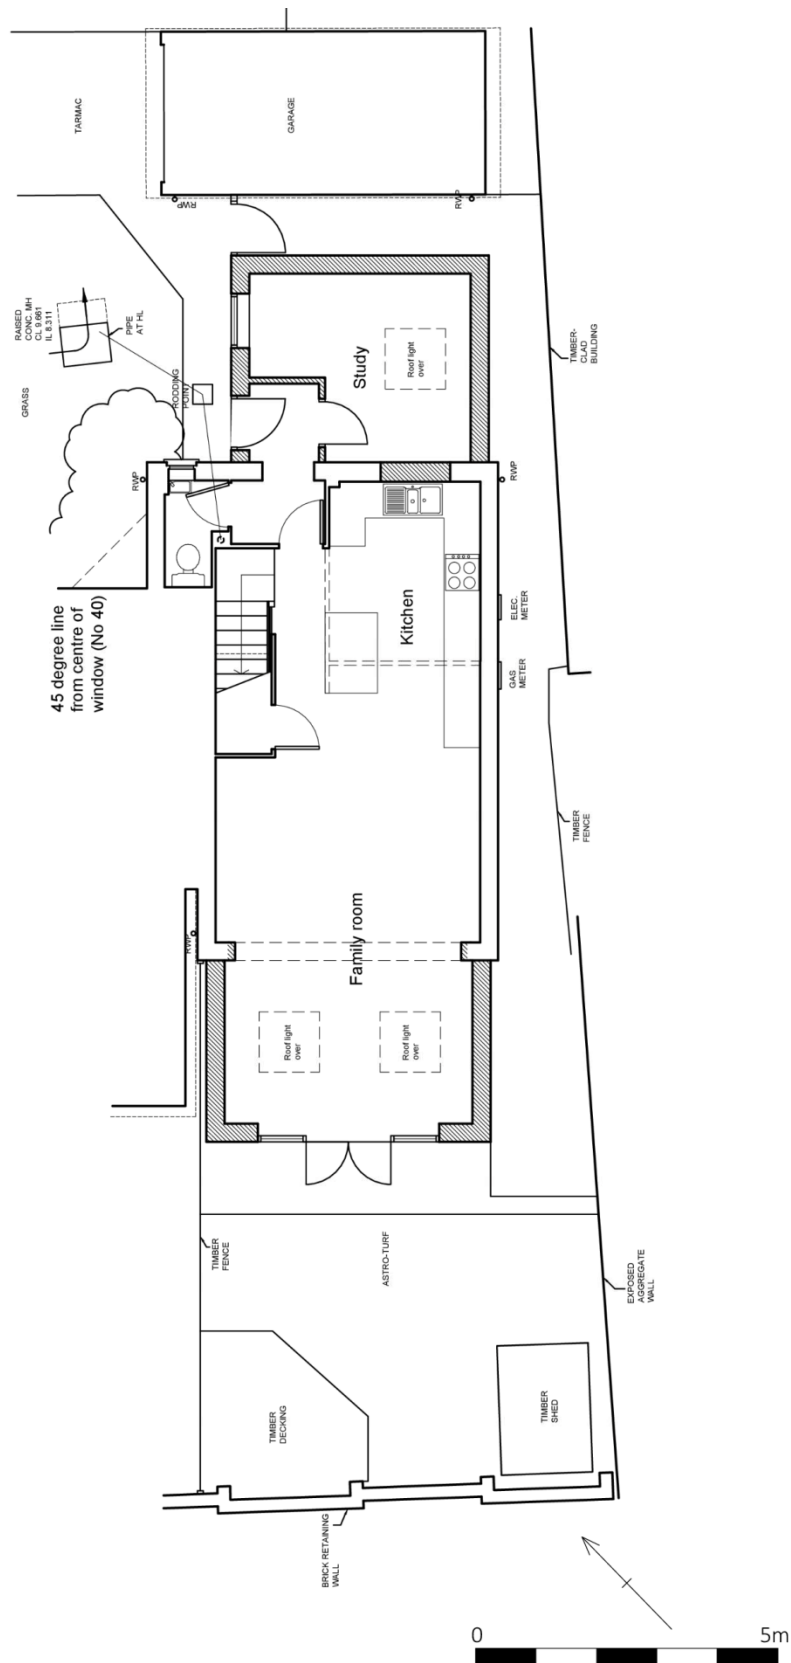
Development plan (scale 1:125). The extensions shaded grey.
